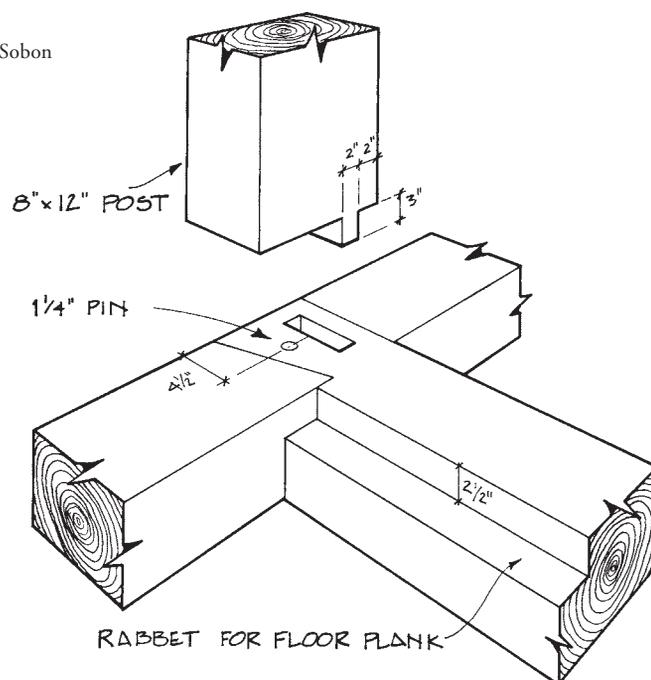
Views of lapped half-dovetail girder joint in a pre-1820 scribe rule Dutch barn moved from Fort Plain to Altamont, N.Y. The interior sill is rabbetted for the 2 1/2-in. splined plank threshing floor.
